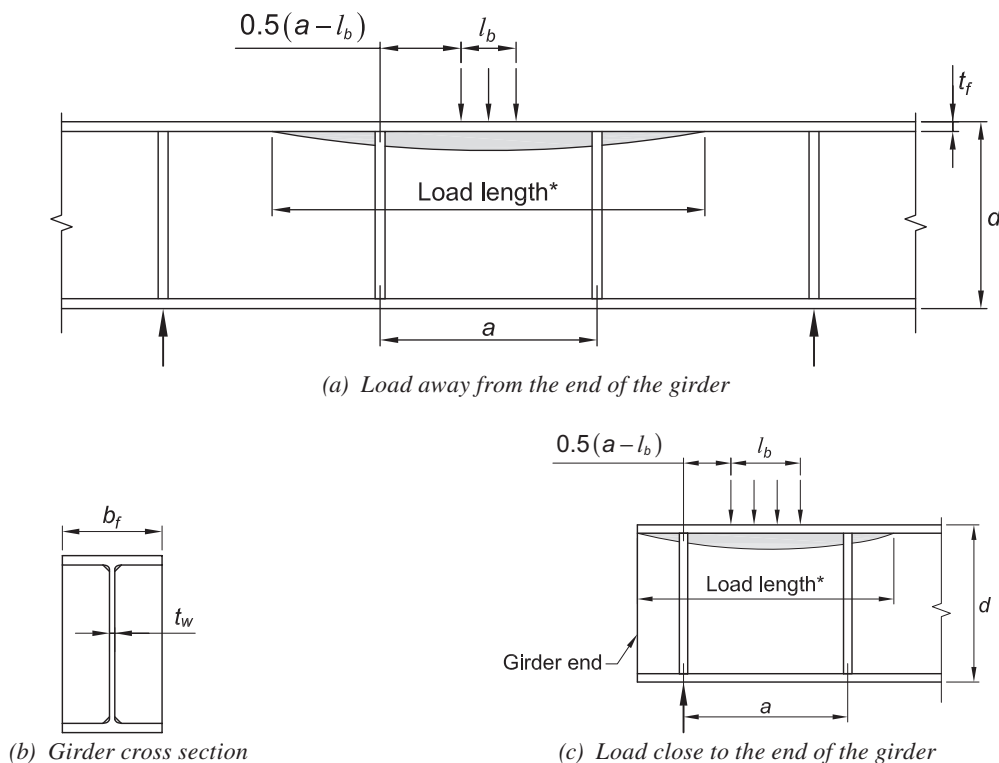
Built-up I-girder under concentrated loads (*nominal load length shown in absence of vertical stiffeners).
